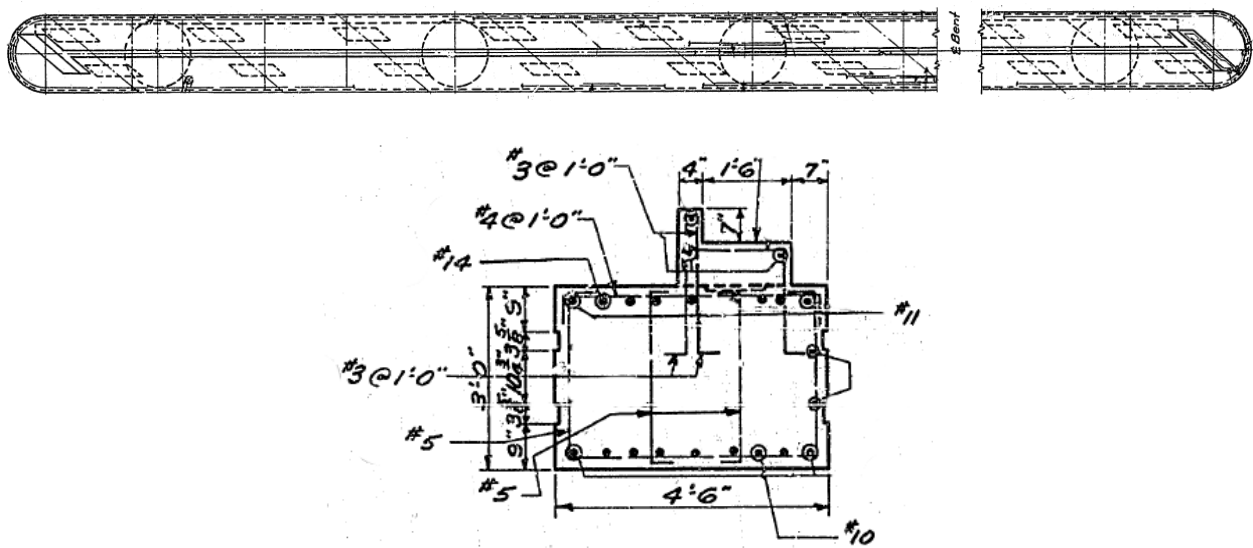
Plan (for typical six column bent) and section view of crossbeam
